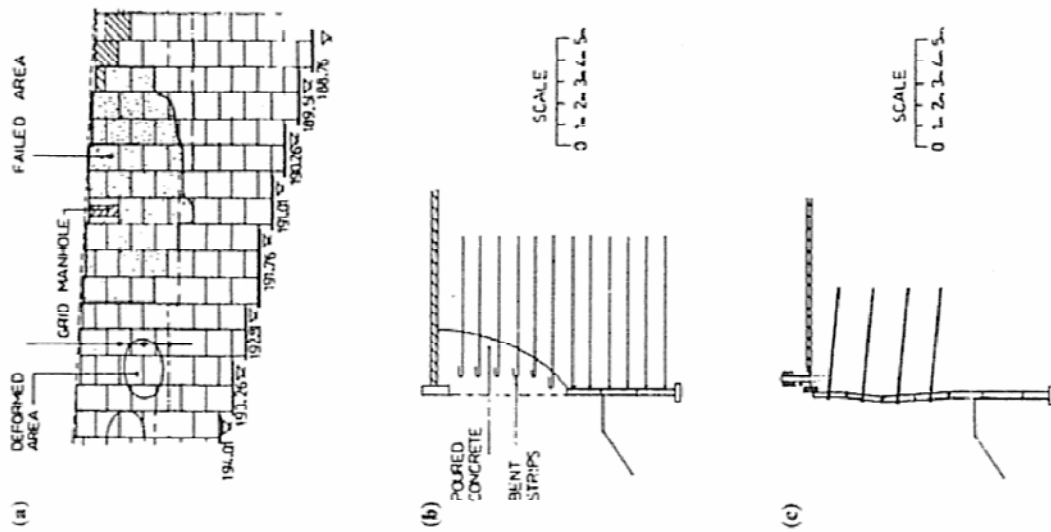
Repair of reinforced earth wall at Fréjus, France. After Long *et al.*<sup>43</sup> (a) Front face view of wall; (b) rebuilding of facing of collapsed area; (c) nailing of repaired zone.
